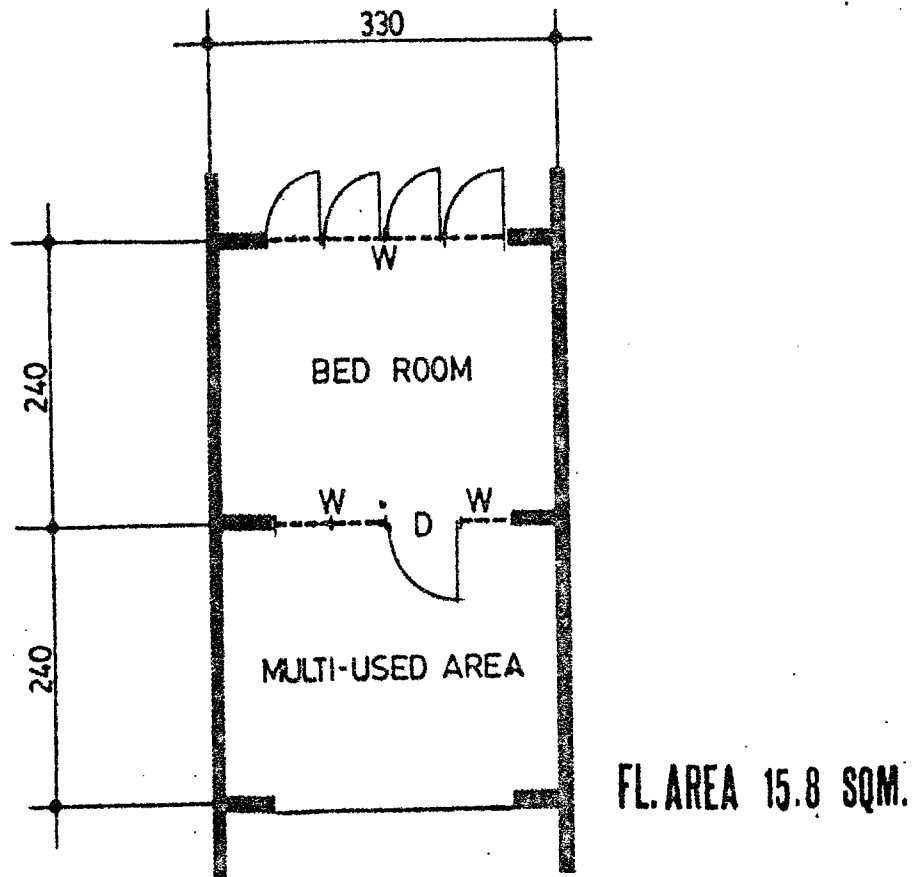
TYPICAL FLOOR PLAN 1:75
